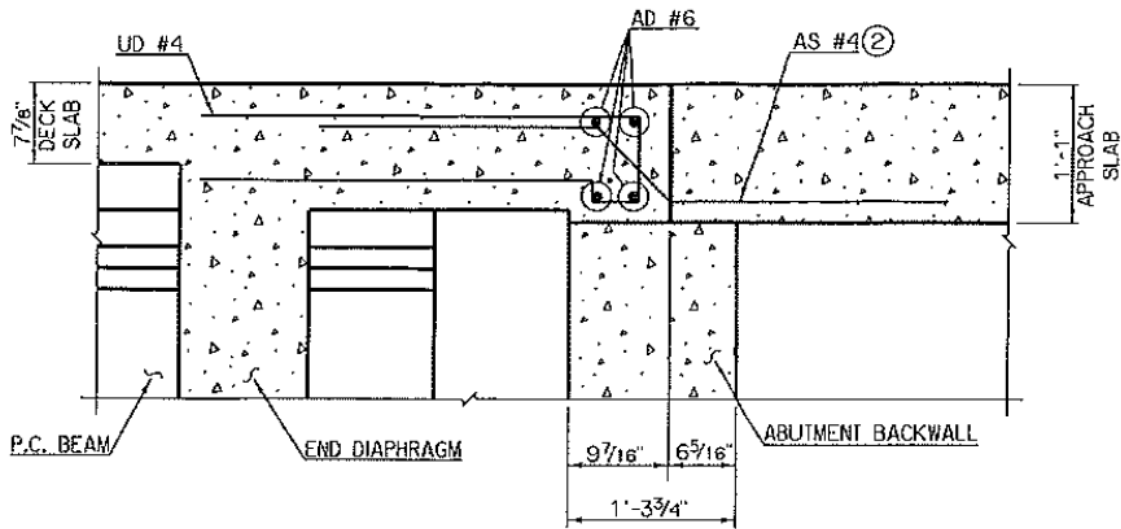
Cross-section through the bridge deck, abutment back wall, and approach slab (EST 2008)
